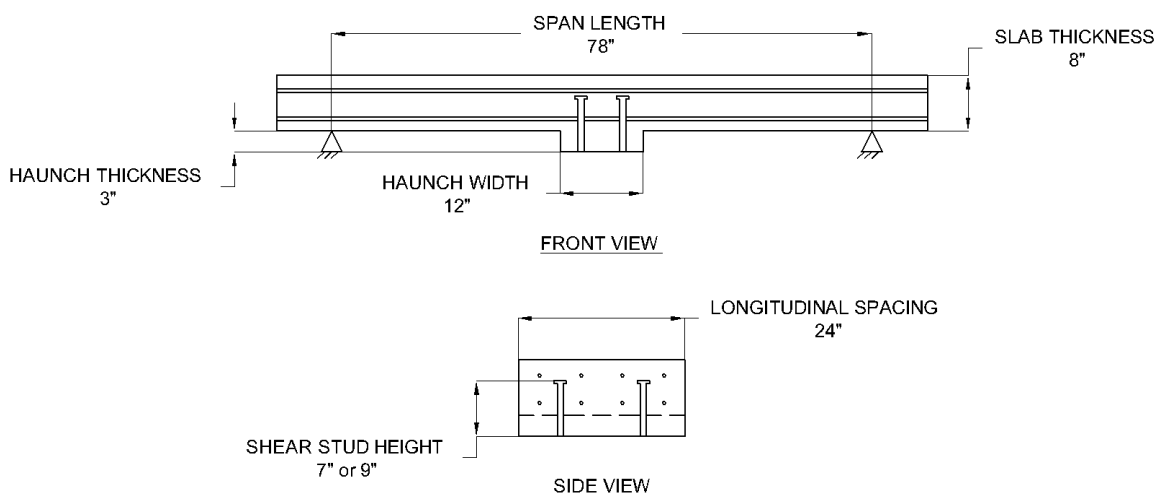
Dimensions of specimens tested by Mouras et al. (2008) [12]
